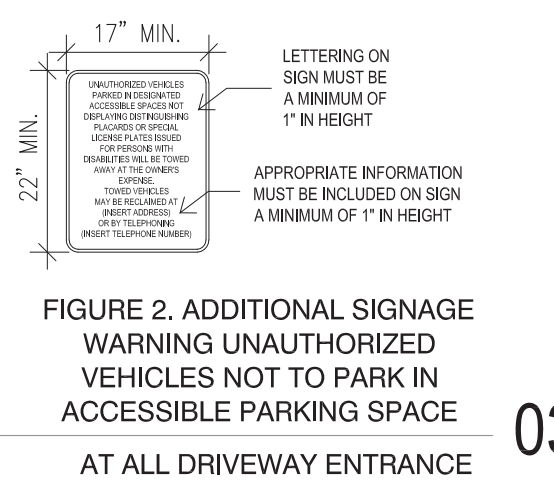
ADDITIONAL SIGNAGE WARNING UNAUTHORIZED VEHICLES NOT TO PARK IN ACCESSIBLE PARKING SPACE AT ALL DRIVEWAY ENTRANCE 03
